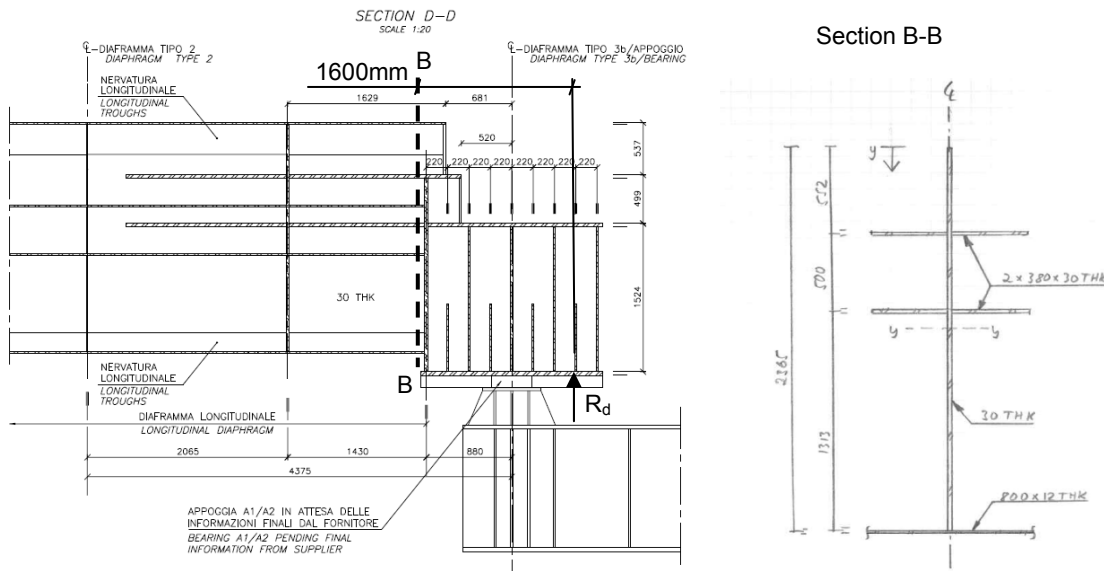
Section D-D and section B-B at cut out for expansion joint
